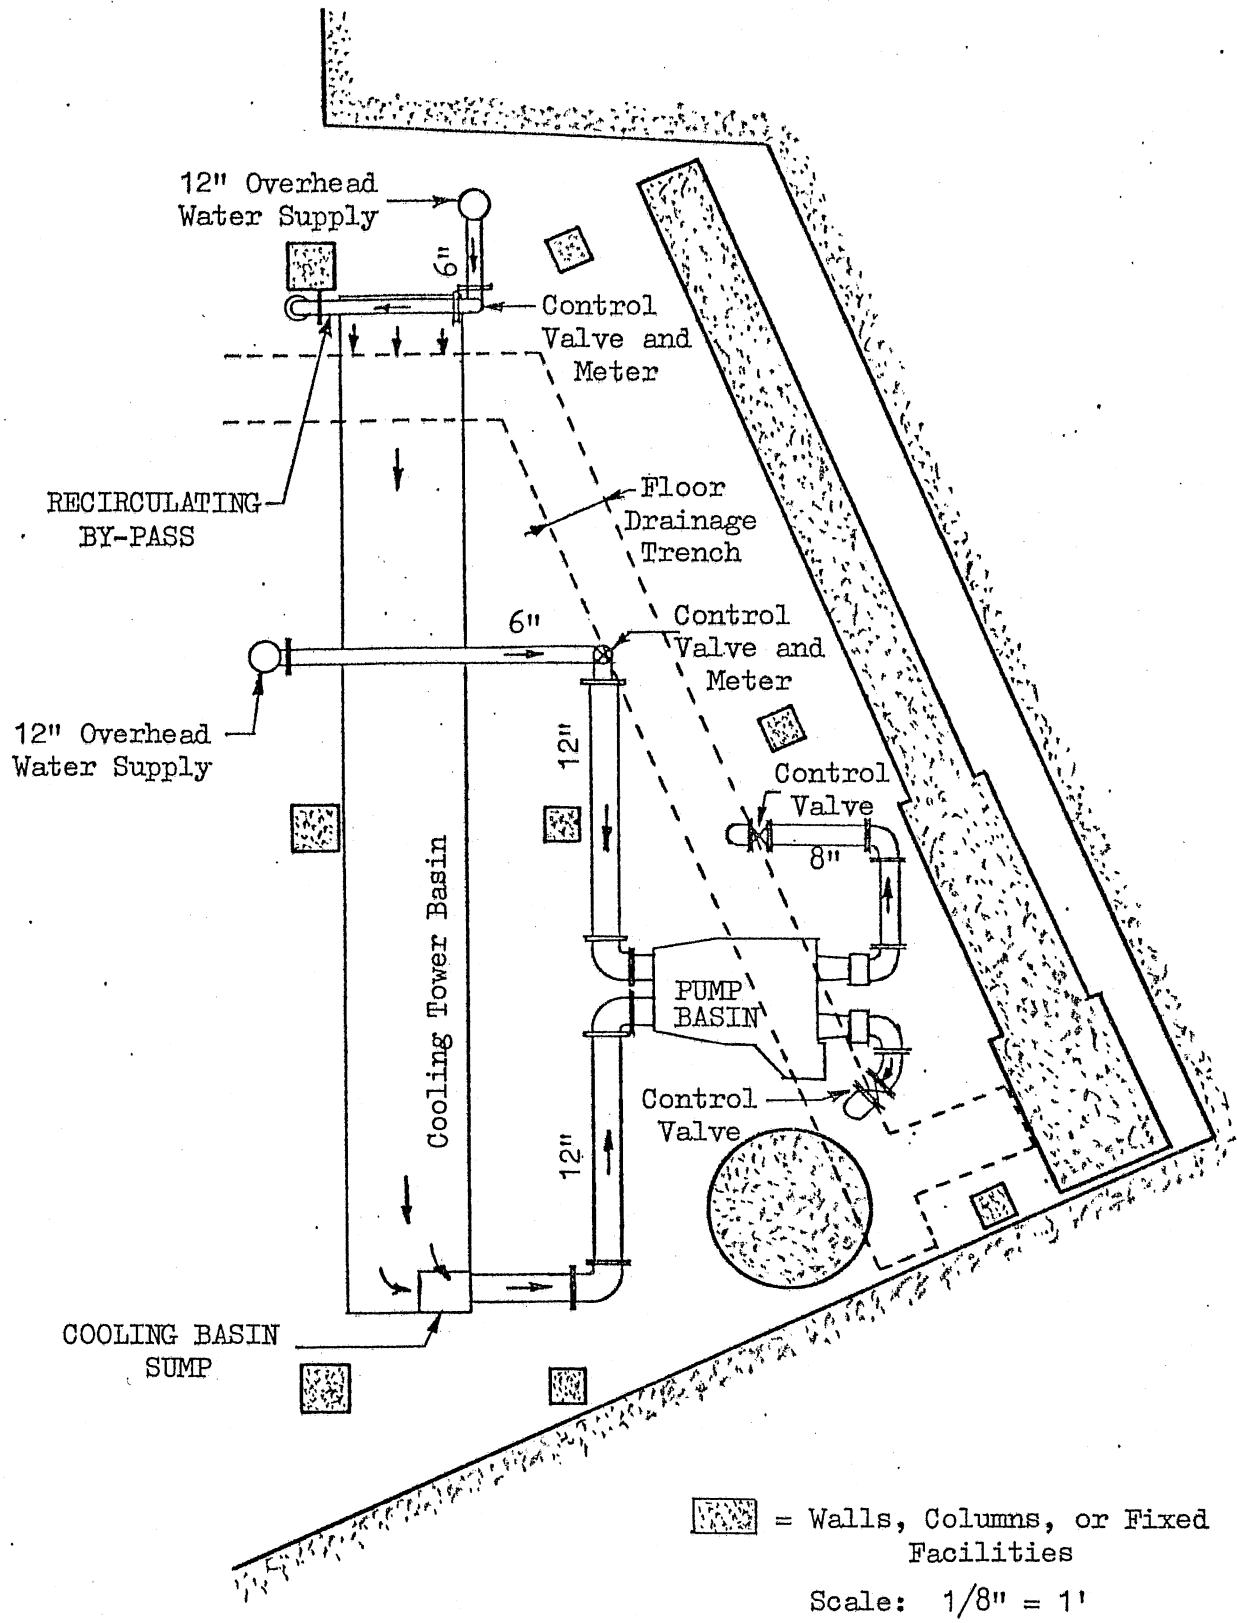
Laboratory Layout for the 1:12 Scale Model.
